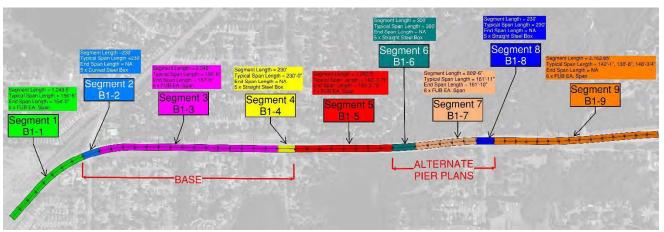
B1–SR 414 Viaduct Layout and Framing Plan
